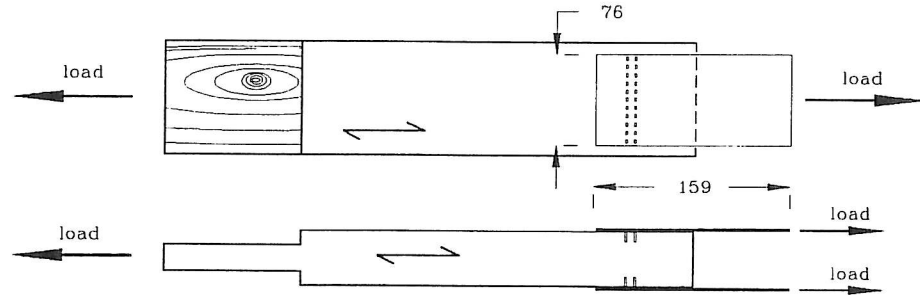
Test specimen in series 1-22. Dimensions in mm.
